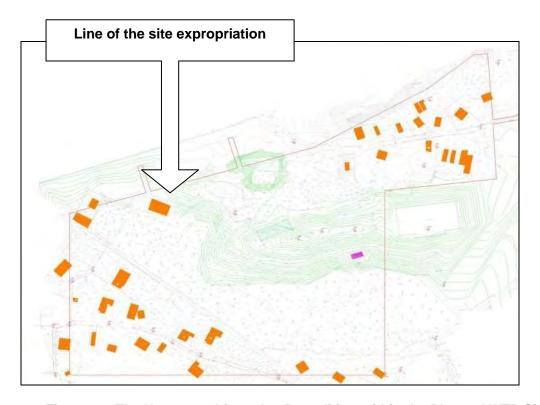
The Houses subjected to Demolition within the Planned WTP Site
